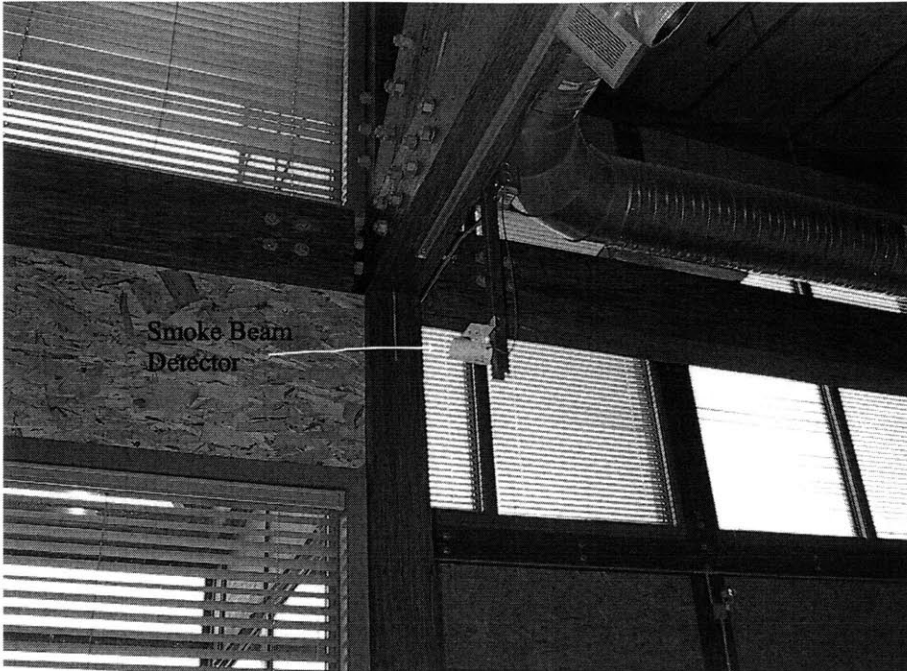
Smoke beam detector. Several detectors are located throughout the building to detect smoke traveling from the first floor to the second floor. This was one of the primary ways fire codes were satisfied with such an open plan building.
